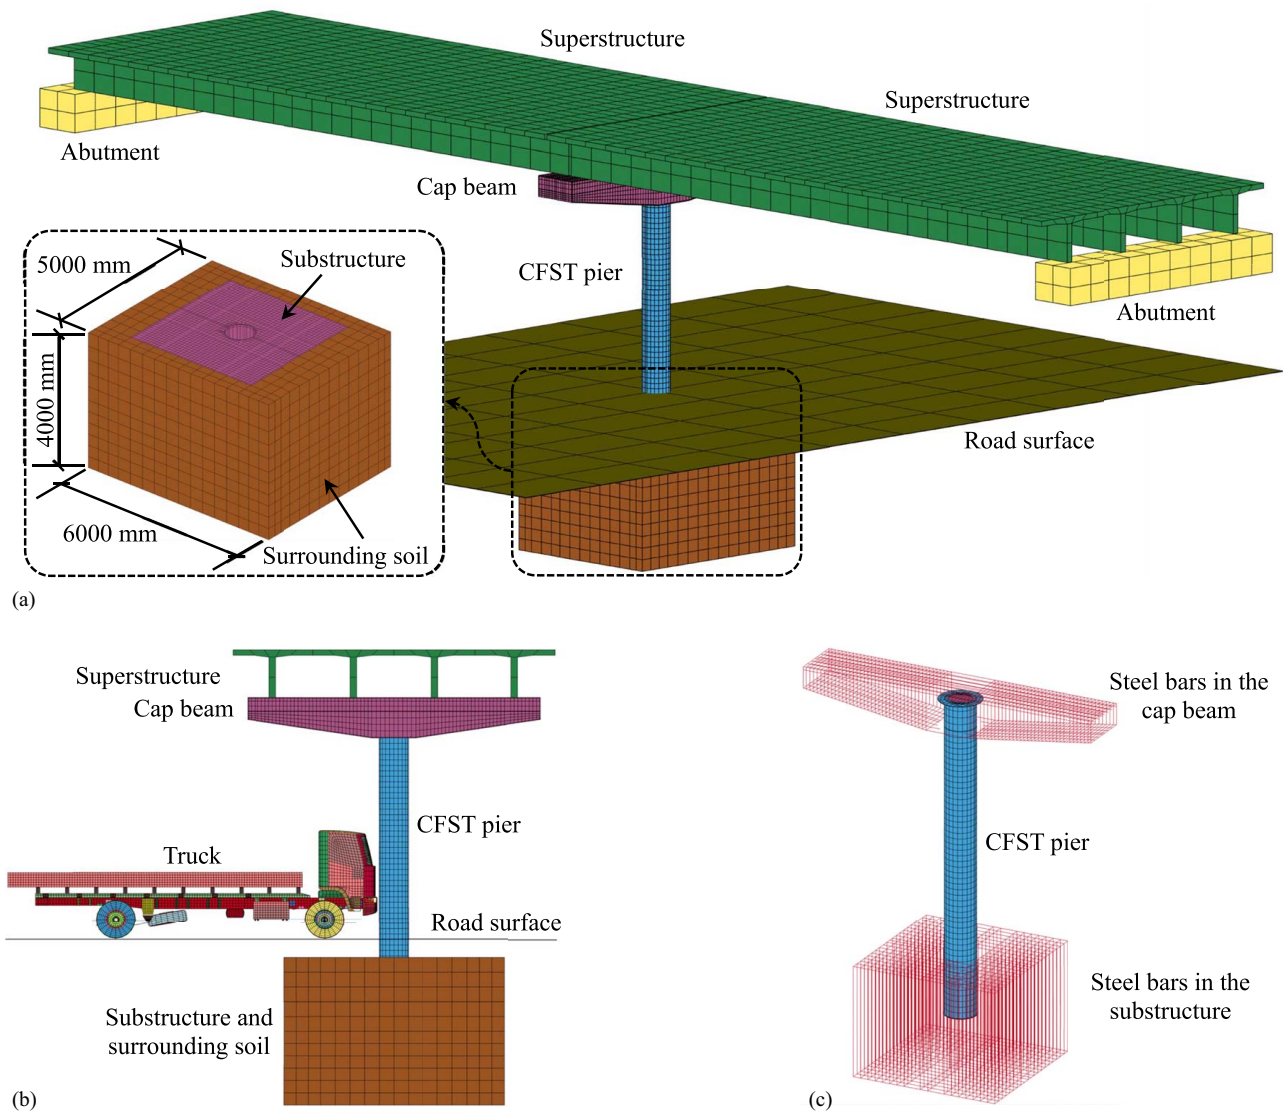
Detailed FE model: (a) bridge specimen (oblique view); (b) modified truck model collision with CFST pier (side view); and (c) CFST pier and steel bars in the cap beam and substructure.
